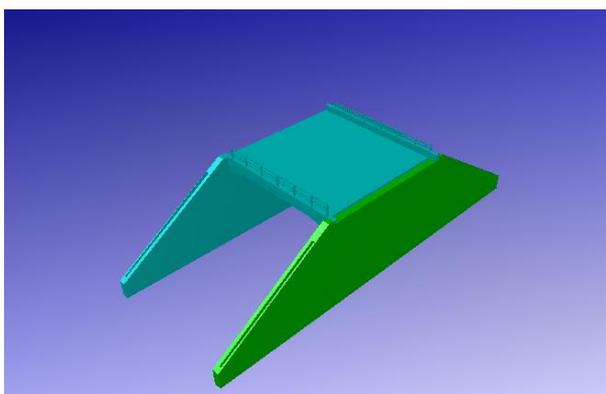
The history of damage parts and previous inspections on a three dimensional model
